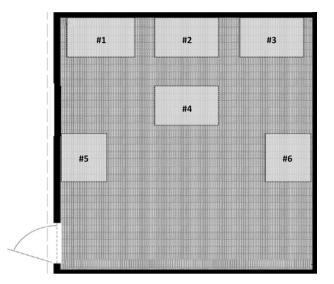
Simulation compartment layout—floor plan with fire positions identified.
